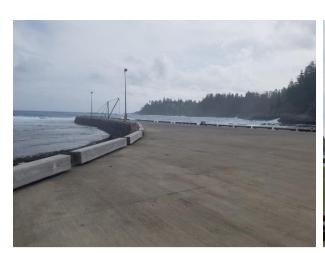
View of Kingston Pier showing loading and unloading structures on the pier
